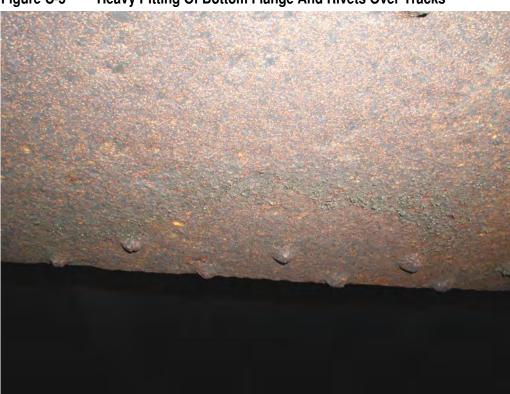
Heavy Pitting Of Bottom Flange And Rivets Over Tracks
